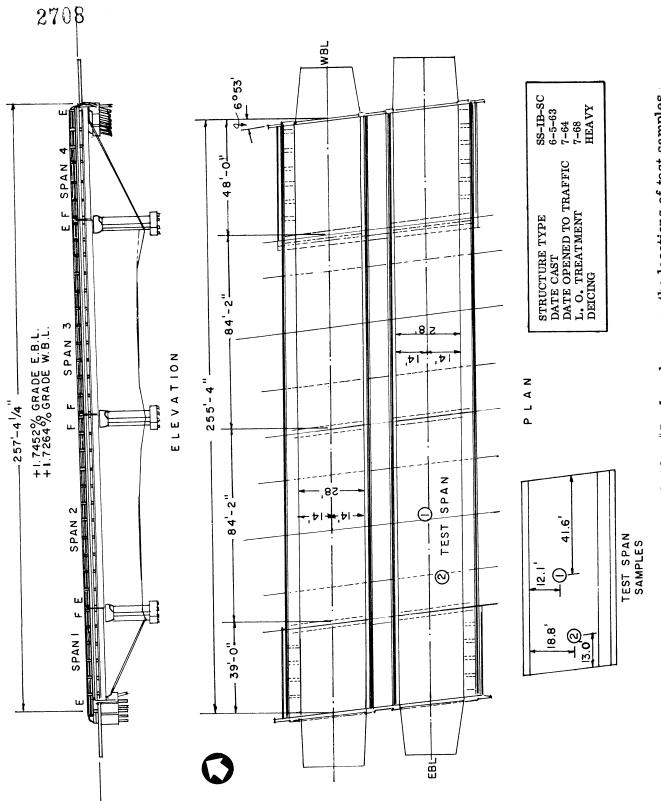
Plan for bridge #4; also shown are the locations of test samples.
